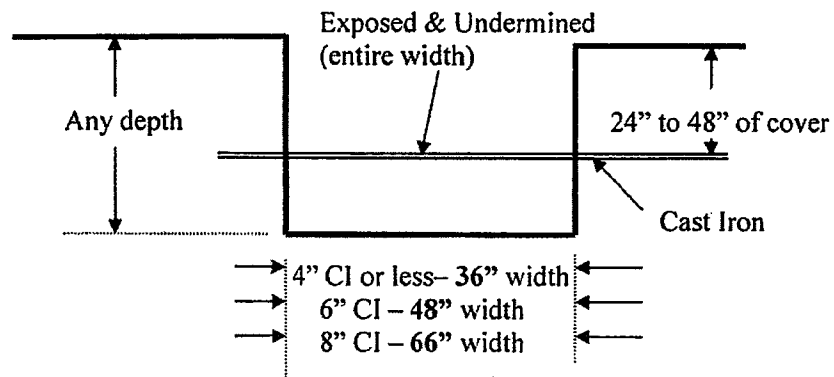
Construction Running Cross Trench to Cast Iron Mains
